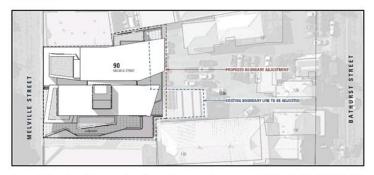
location of current boundary adjustment (base source: JAWS ARCHITECTS, Site Plan, Dwg 19066_DA02, REV02 17 Mar 2020)
